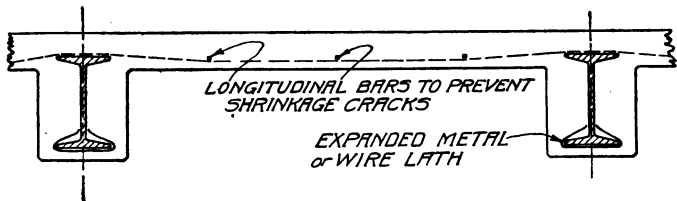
Diagram Showing Method of Placing Concrete Floor Slabs on I-Beam Girders
